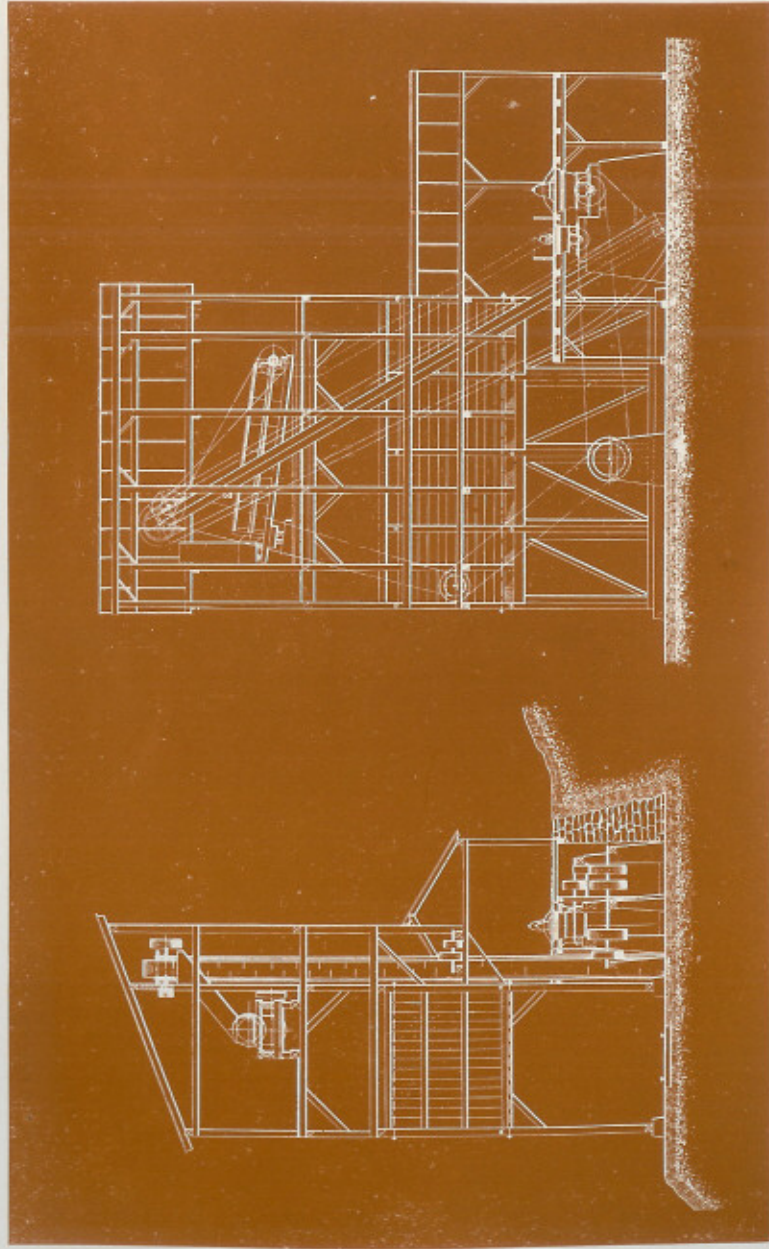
Plant, on narrow footing, consisting of one No. 5 and one No. 3 Symons Crusher, on same level, both discharging into single elevator.
